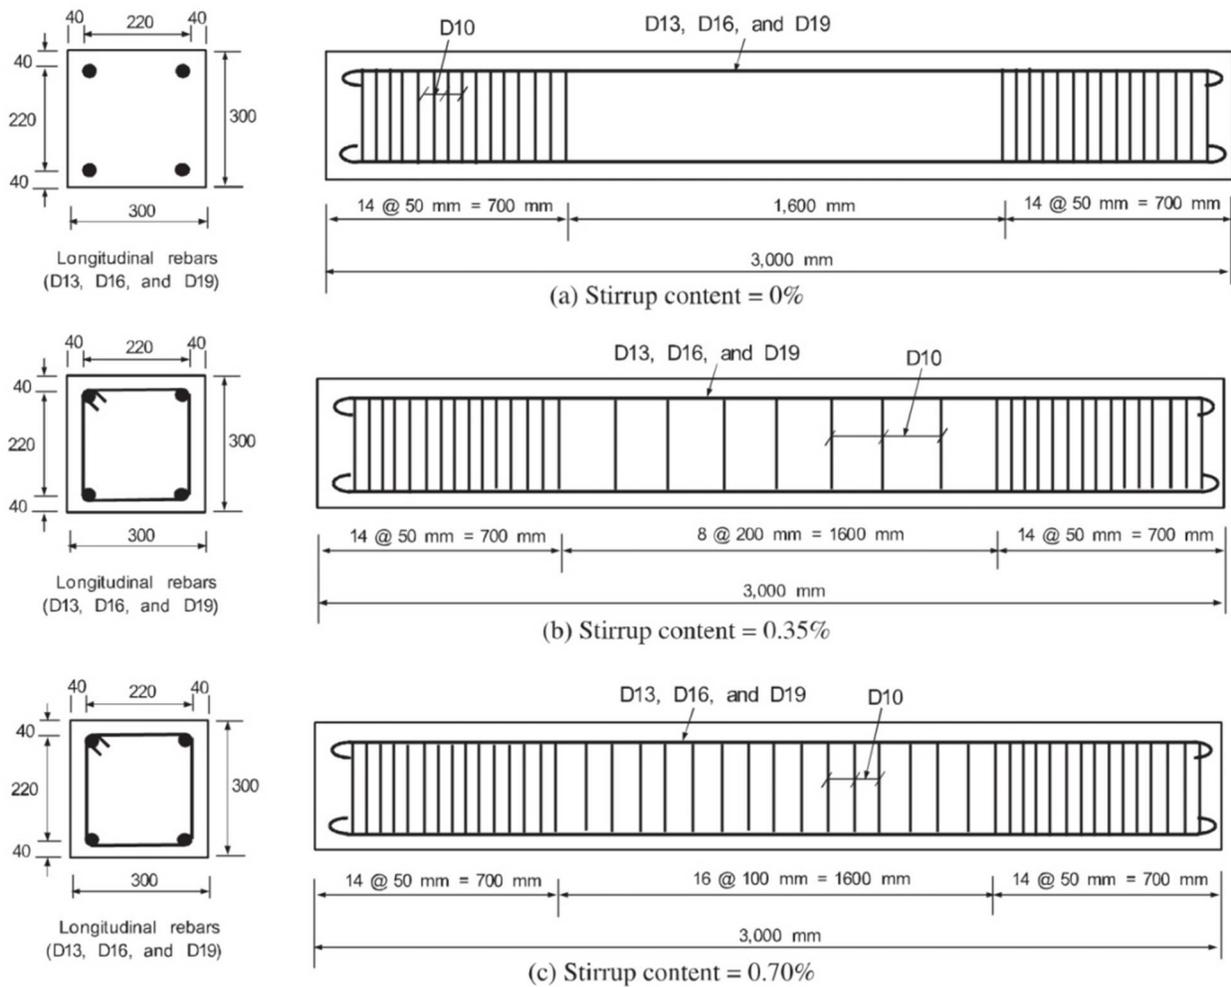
Beams detail tested by In-Hwan Yang et. al. (2013)
